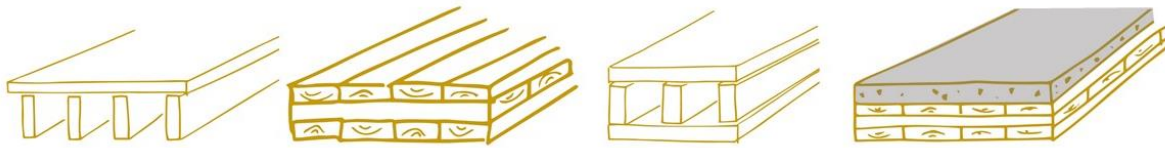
From left to right wooden beam layer, CLT floor, hollow core timber floor, and TCC floor
